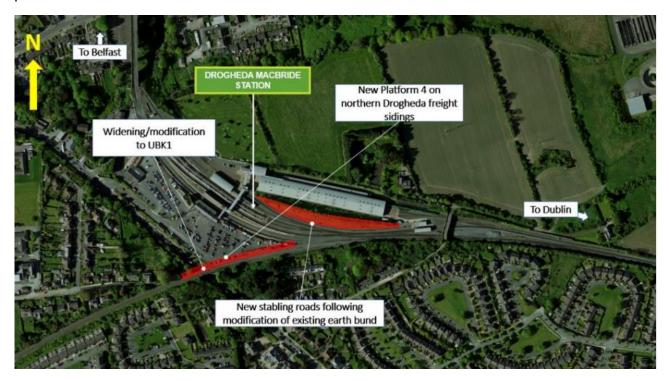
Preferred Option (note new stabling road covered in Section 6 Depot Works)
